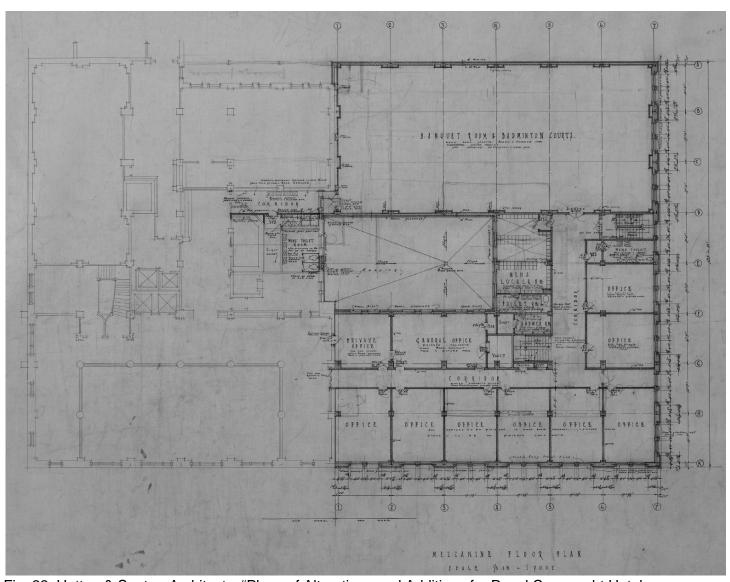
Hutton & Souter, Architects, "Plans of Alterations and Additions for Royal Connaught Hotel Hamilton," 27 Apr. 1931, Souter, Bell, Howard and Souter Fonds, Archives of Ontario, C12-1-0-458, Container # L-717, Barcode B732587, Drawing No. 3 – Mezzanine Floor Plan.
